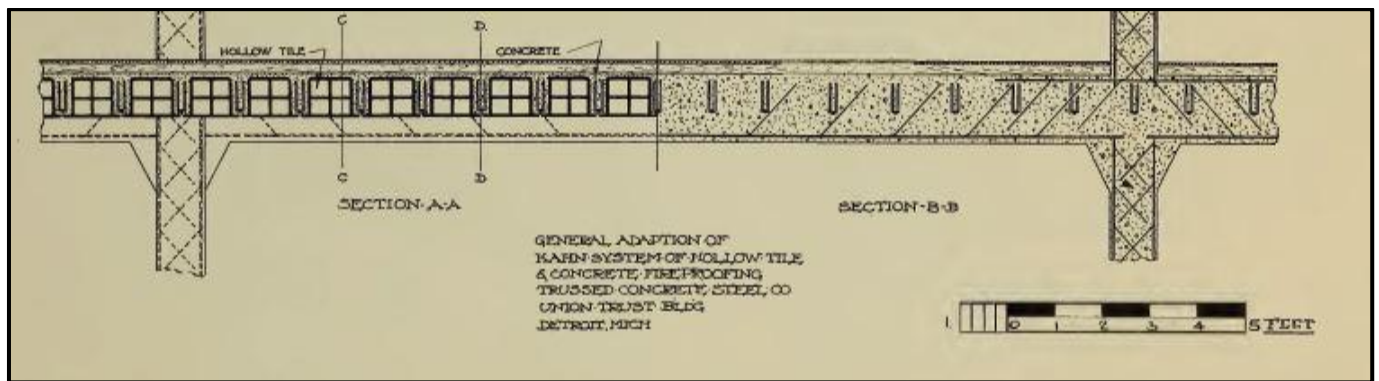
The Kahn System of Hollow Tile Floor Construction.
